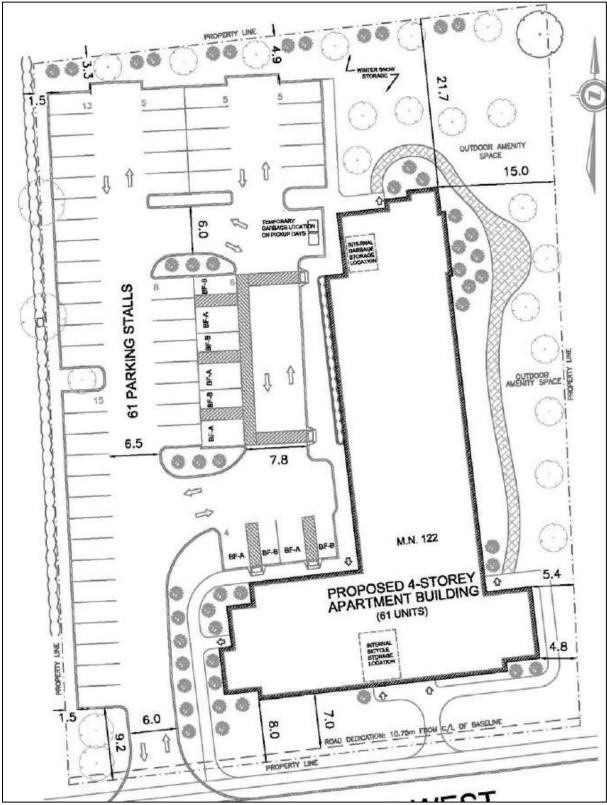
122 Base Line Road West - Conceptual Site Plan
